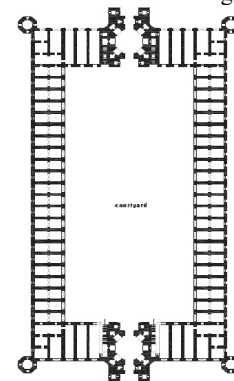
Drawing of the ground floor of Bara Katra (Source: Department of Archaeology, Bangladesh)
